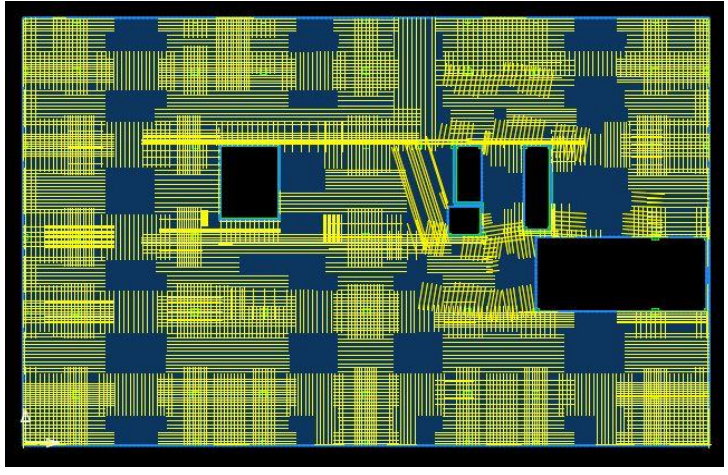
RAM concept model of the design status of reinforcement in the modeled two way slab.
